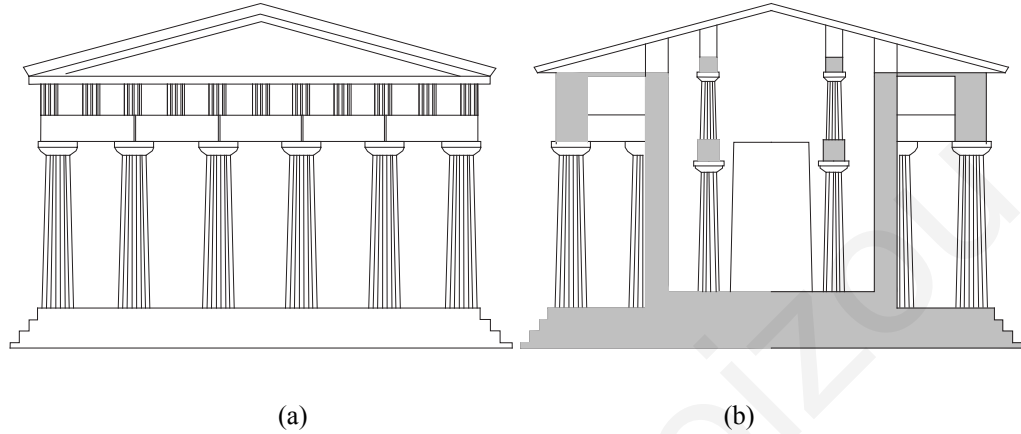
(a) Elevation and (b) section illustration of a typical ancient Greek temple.
